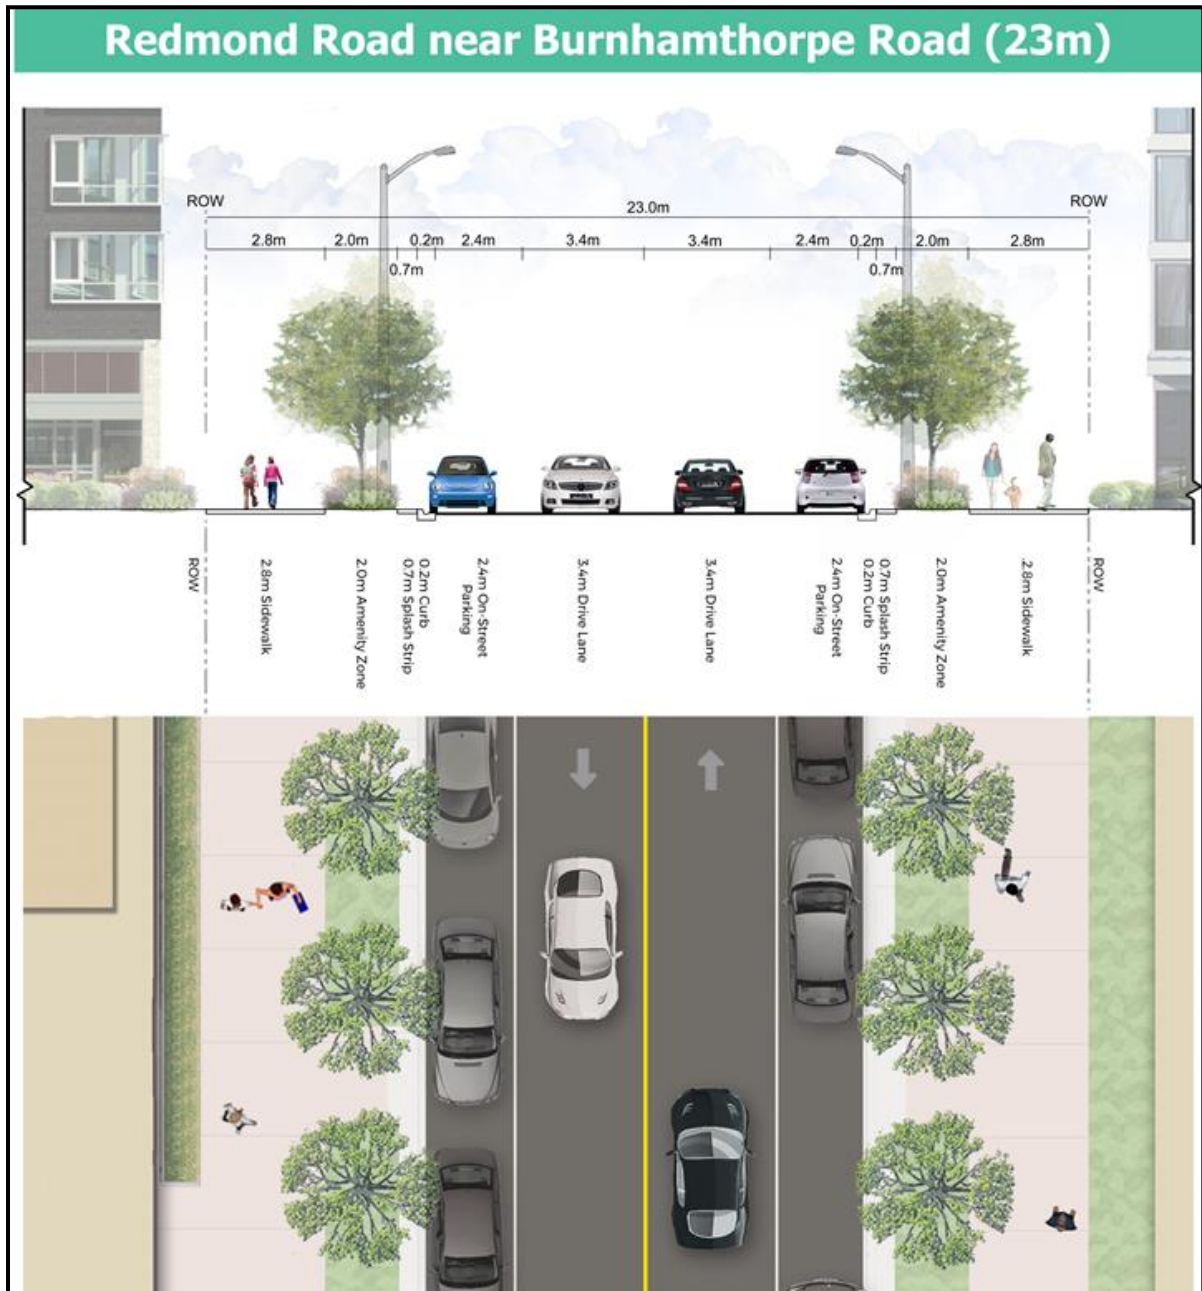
Redmond Road Cross-Sections (near Burnhamthorpe Road)
